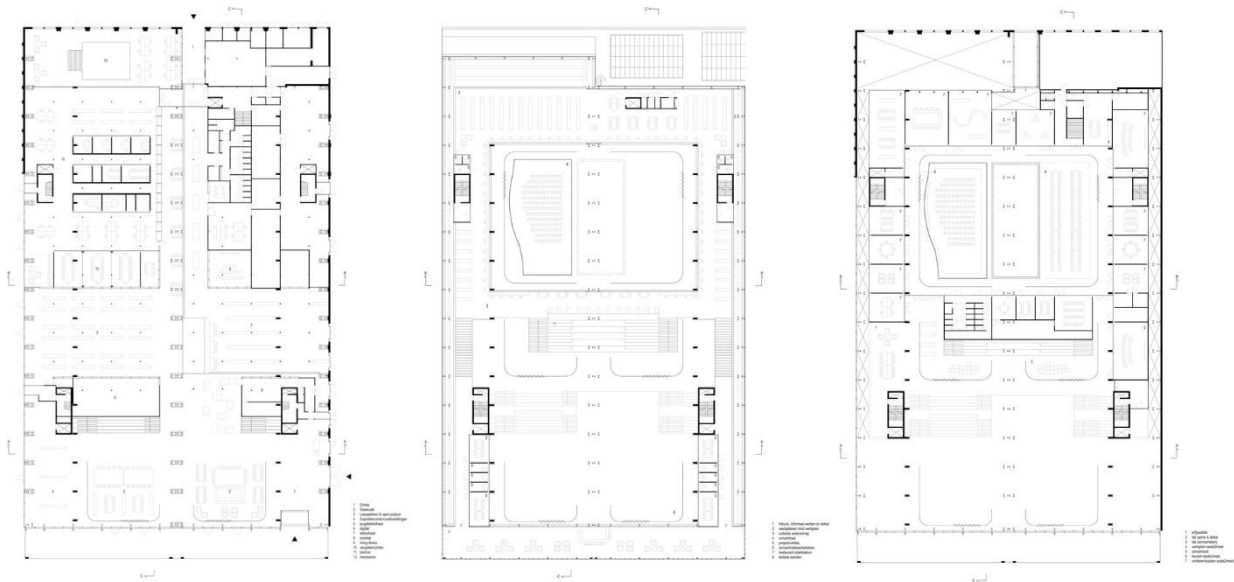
CIVIC architects, Braaksma & Roos architectenbureau, Inside Outside, & Mecanoo. (2019). Floor plans of LocHal Library, Tilburg [Architectural drawings].
